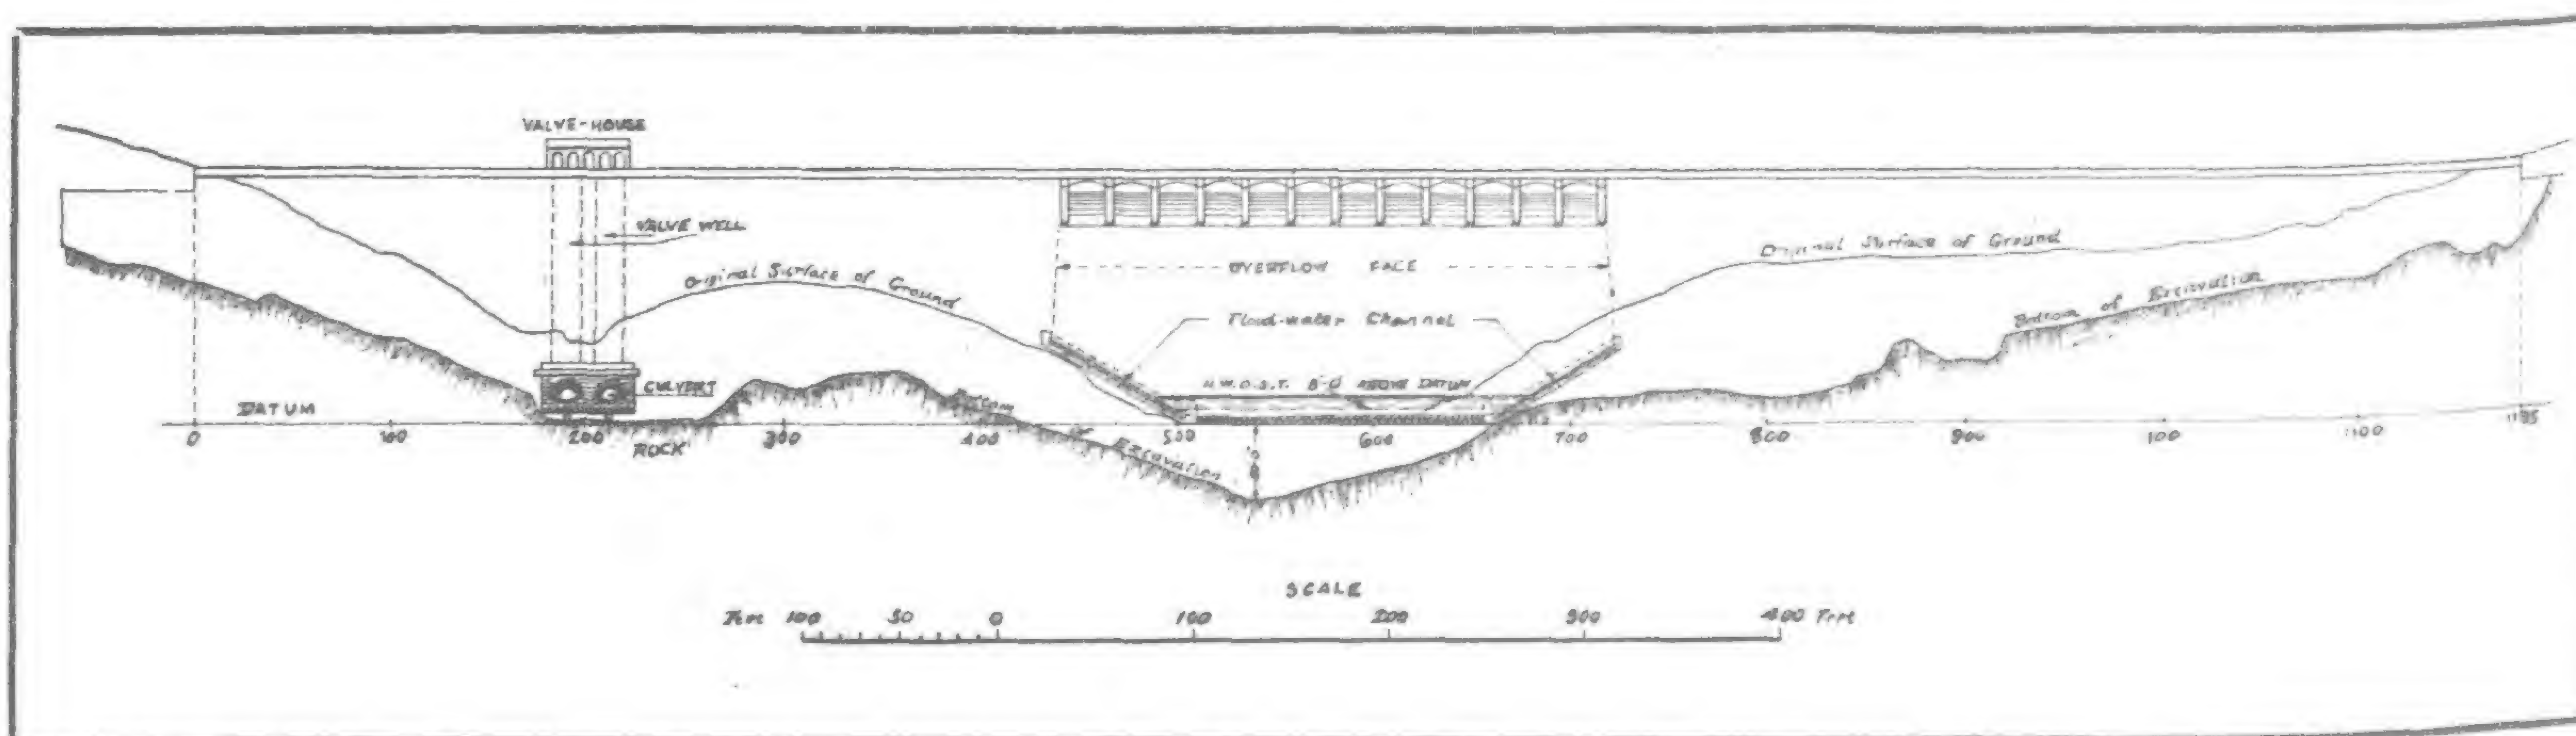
The Tytam Tuk Reservoir. Elevation of dam and excavation for foundations
